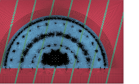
Tunnel surrounding rock damage and overbreak and underbreak information
